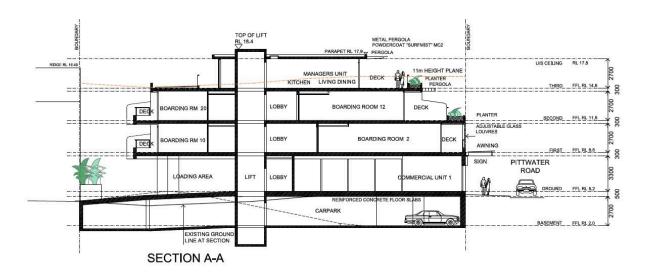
Drawing from Barry Rush & Associates Pty Ltd - Architects, showing a generic cross-section through the site and proposed building.
